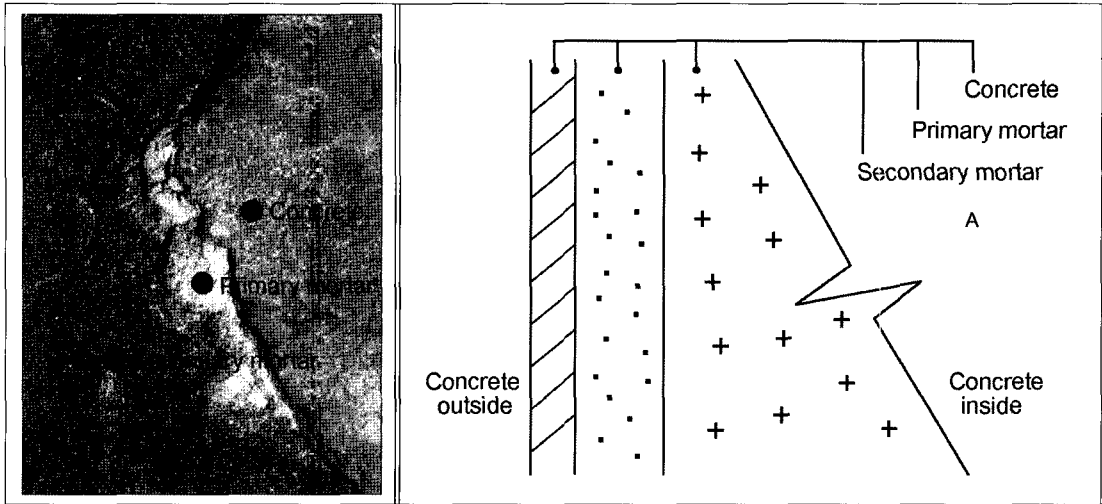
A construction of concrete sample used in Mireuksaii stone pagoda.
